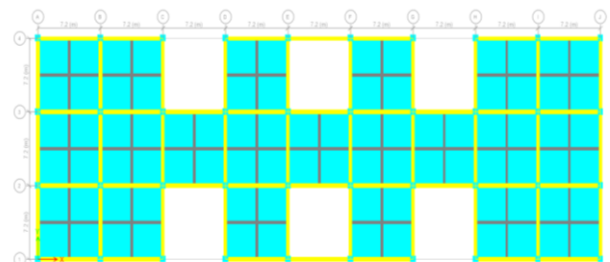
Symmetric 15 Bedded Hospital Building Plan
